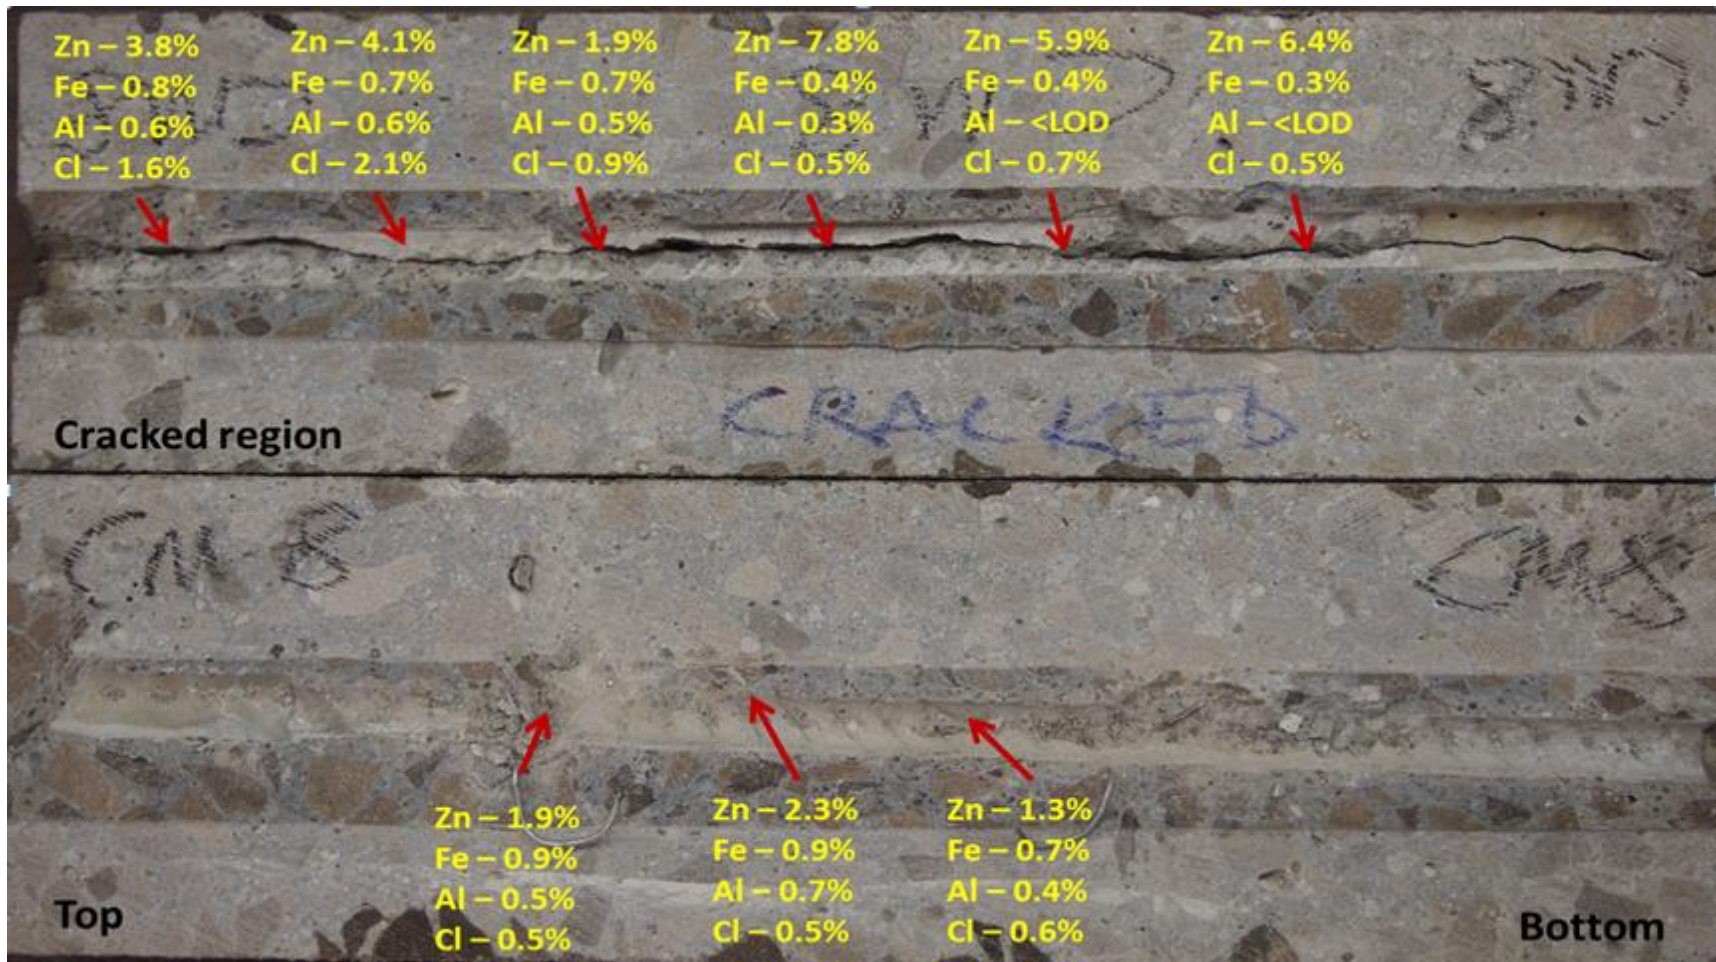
XRF analysis of autopsied longitudinally cracked C1 concrete specimen
